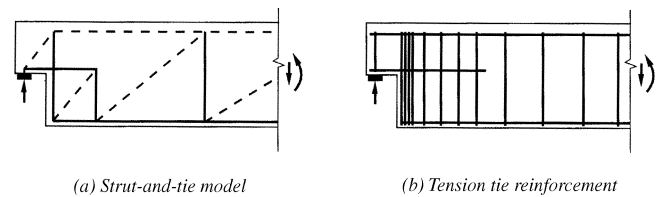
Beam with dapped end, adapted from Schlaich et al. (1987): (a) strut-and-tie model; and (b) tension tie reinforcement.
